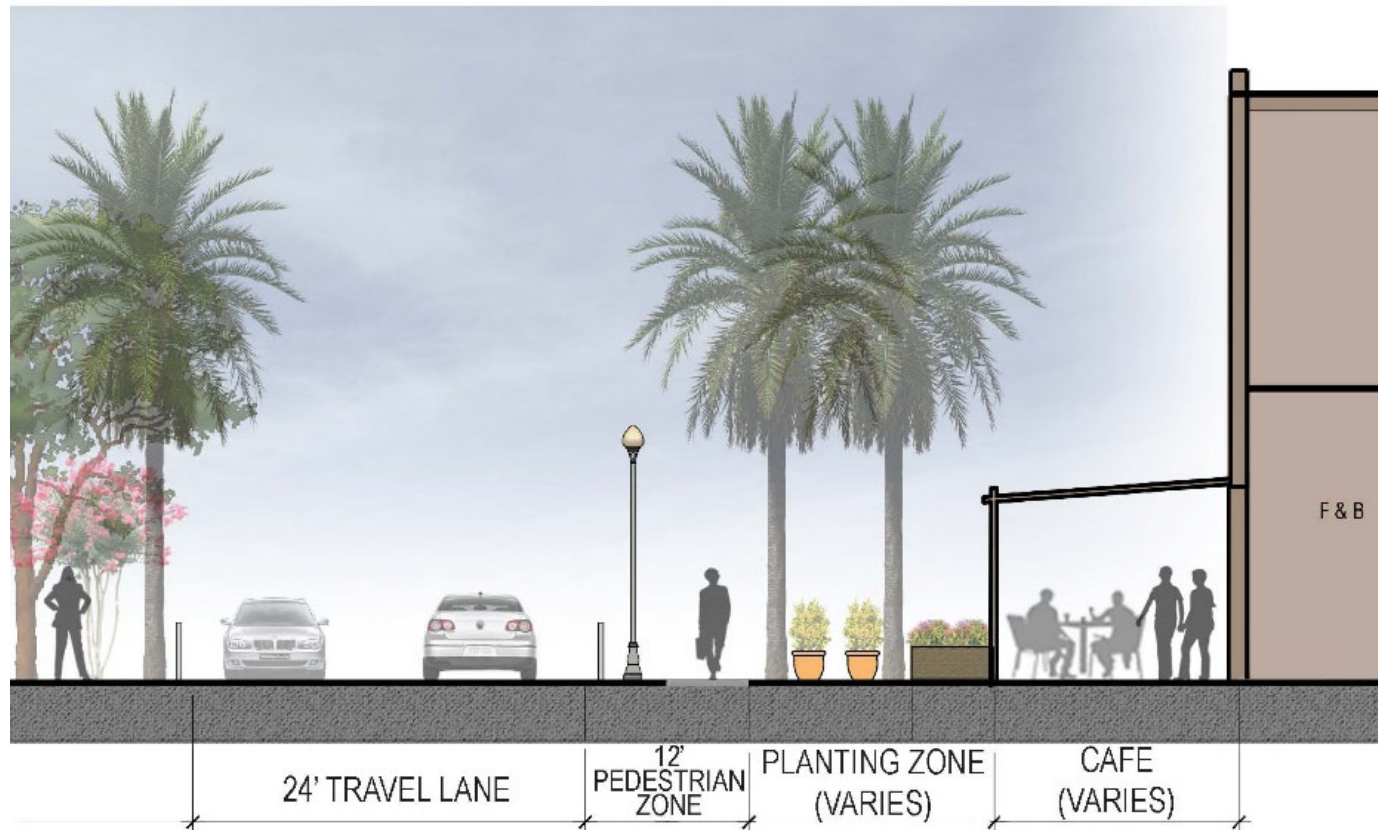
Typical Streetscape (Activated Retail Urban Character)
